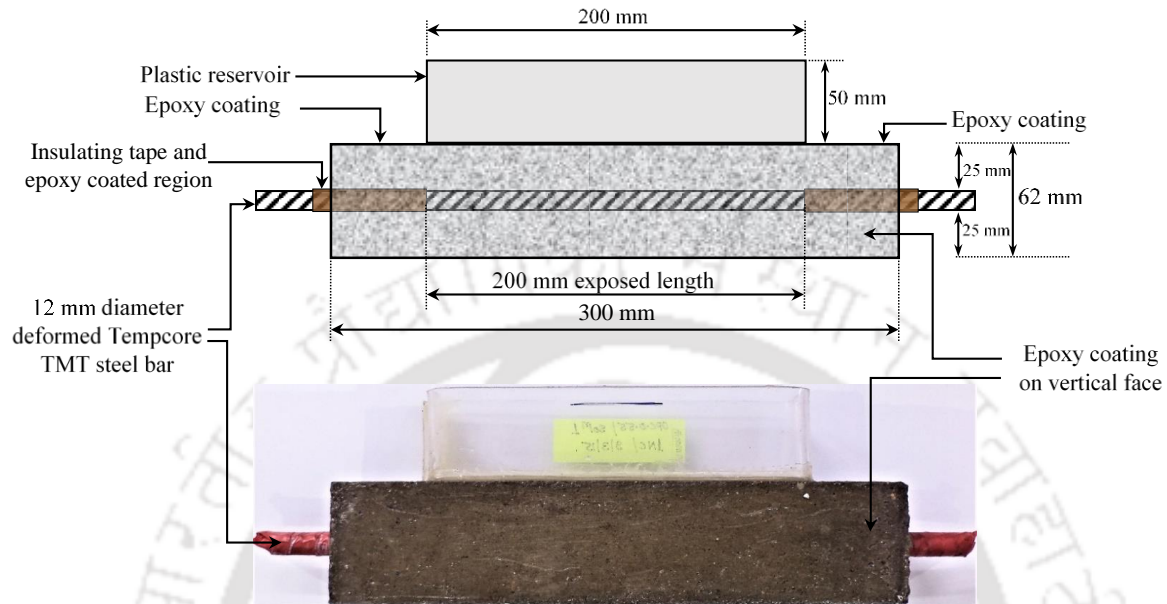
Schematic diagram and photograph of prismatic reinforced concrete specimen with the plastic reservoir
